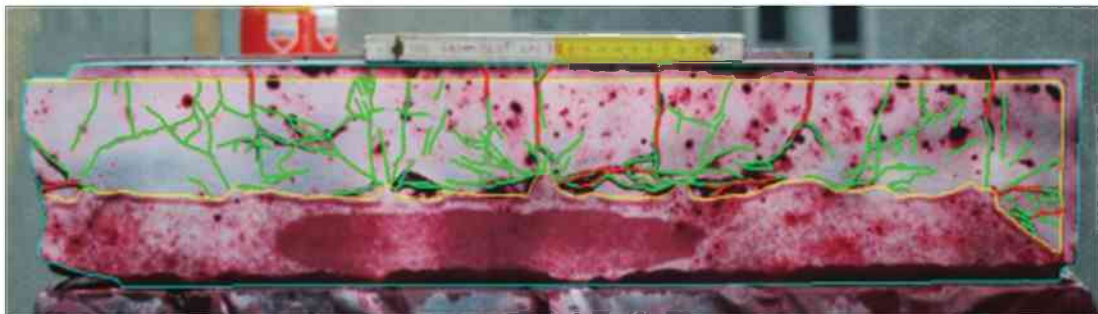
Drawing of crack traces horizontal slice. Slice 3 Block CH01B01
